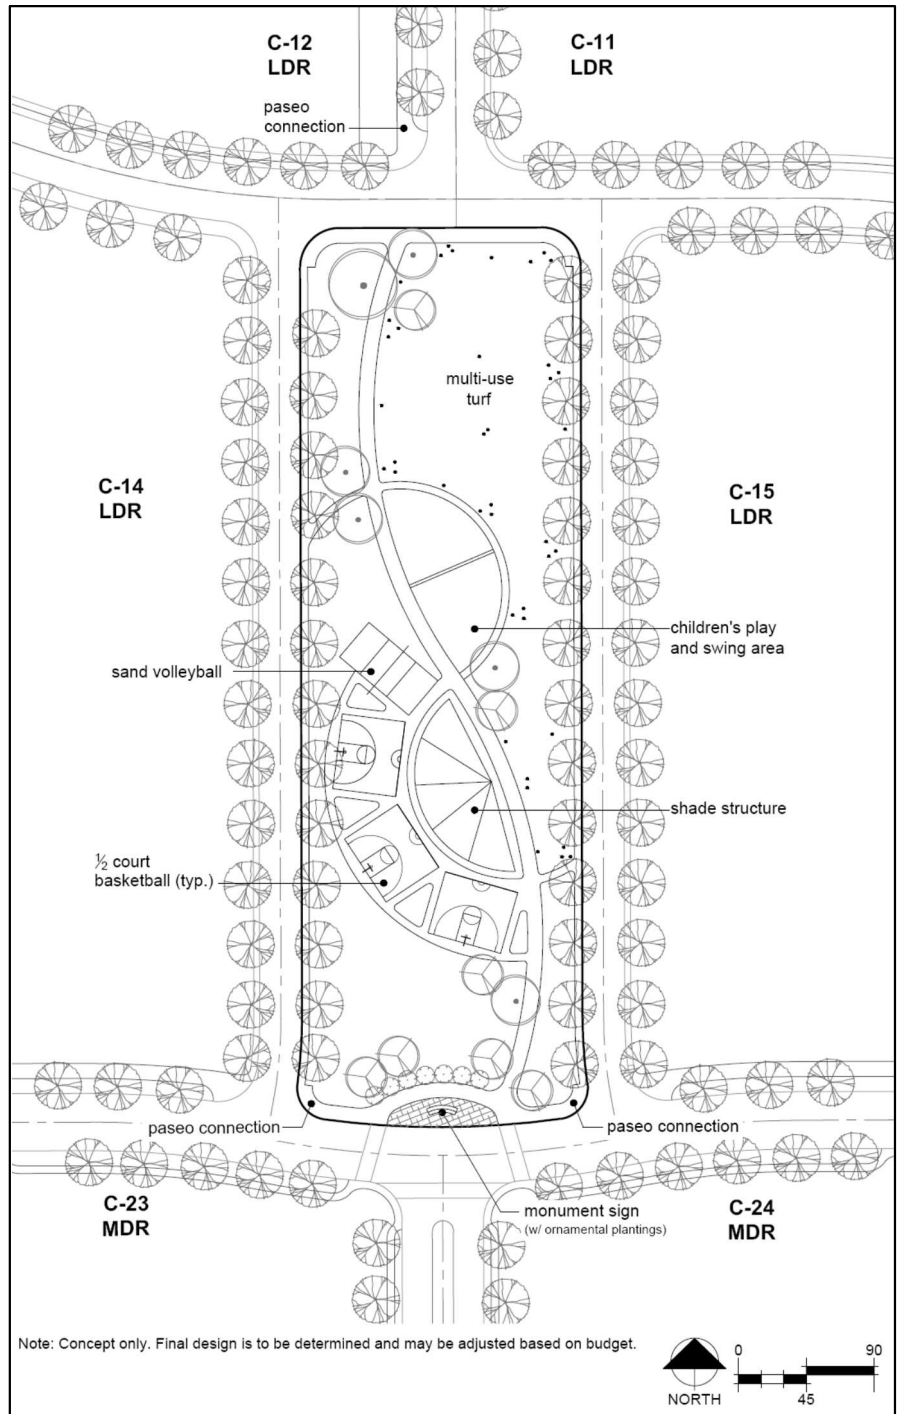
Concept Plan for Neighborhood Park (C-63)
